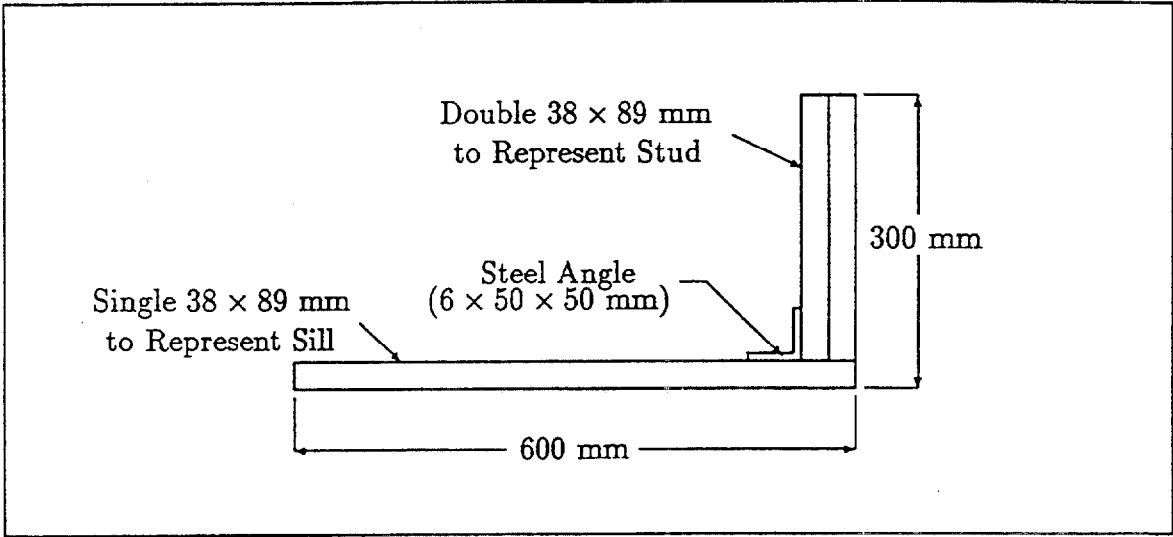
Corner Connection Test Specimen Configuration (after Dolan, 1989).
